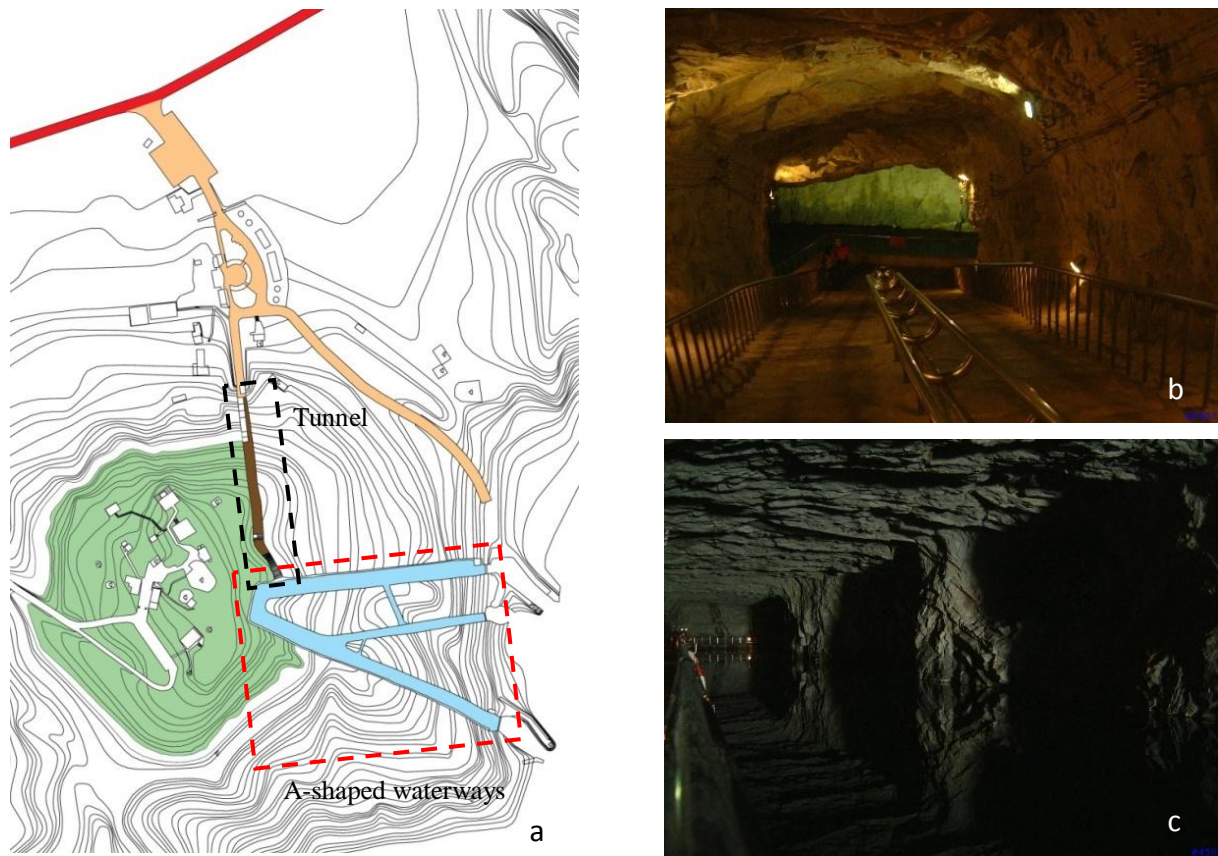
(a) 2D ground plan (b) (c) Photograph showing inside of Zhaishan tunnel shelter and waterways.
